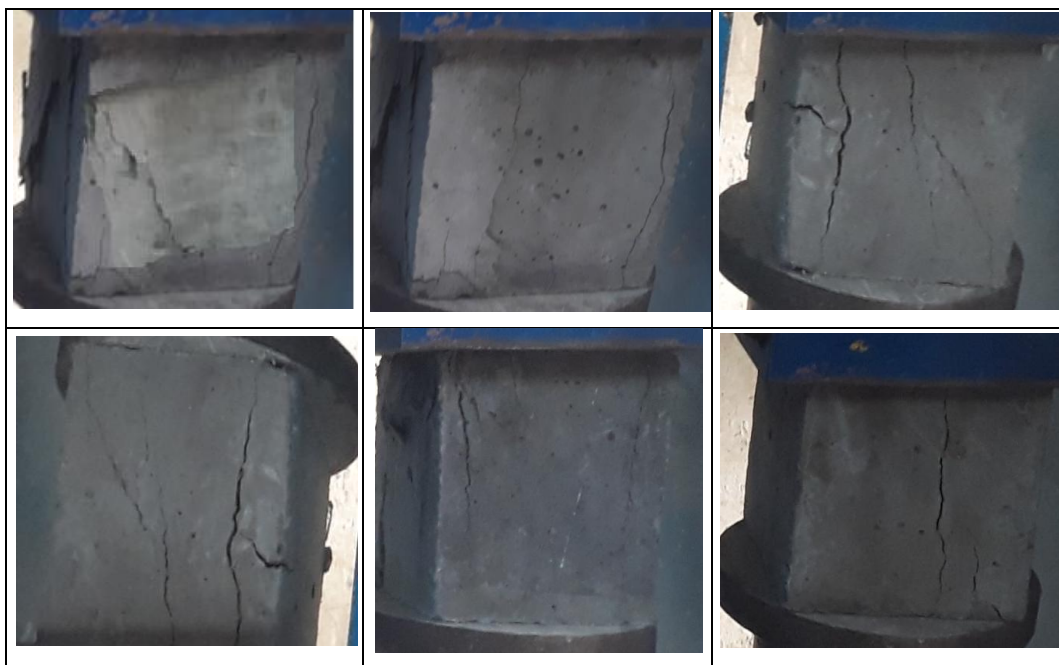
Failure Modes of Cube Specimen Under Compression Testing
